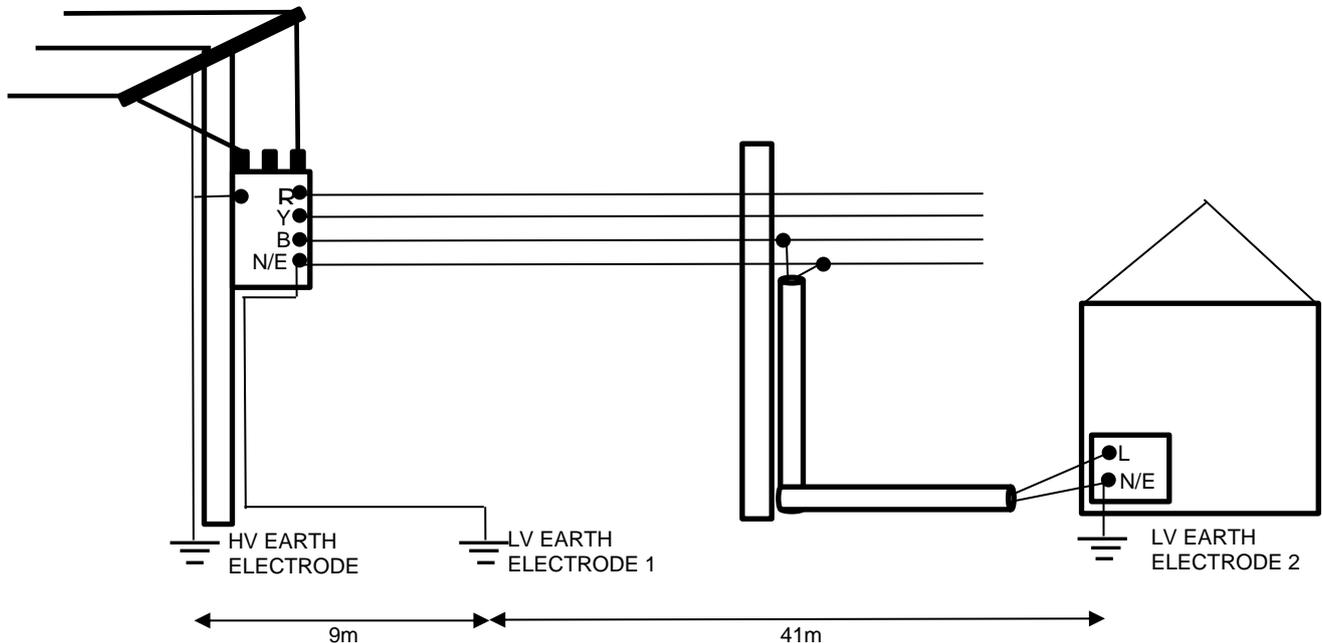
Example Pole-Mounted 11kV Substation Arrangement and LV Supply to a dwelling
